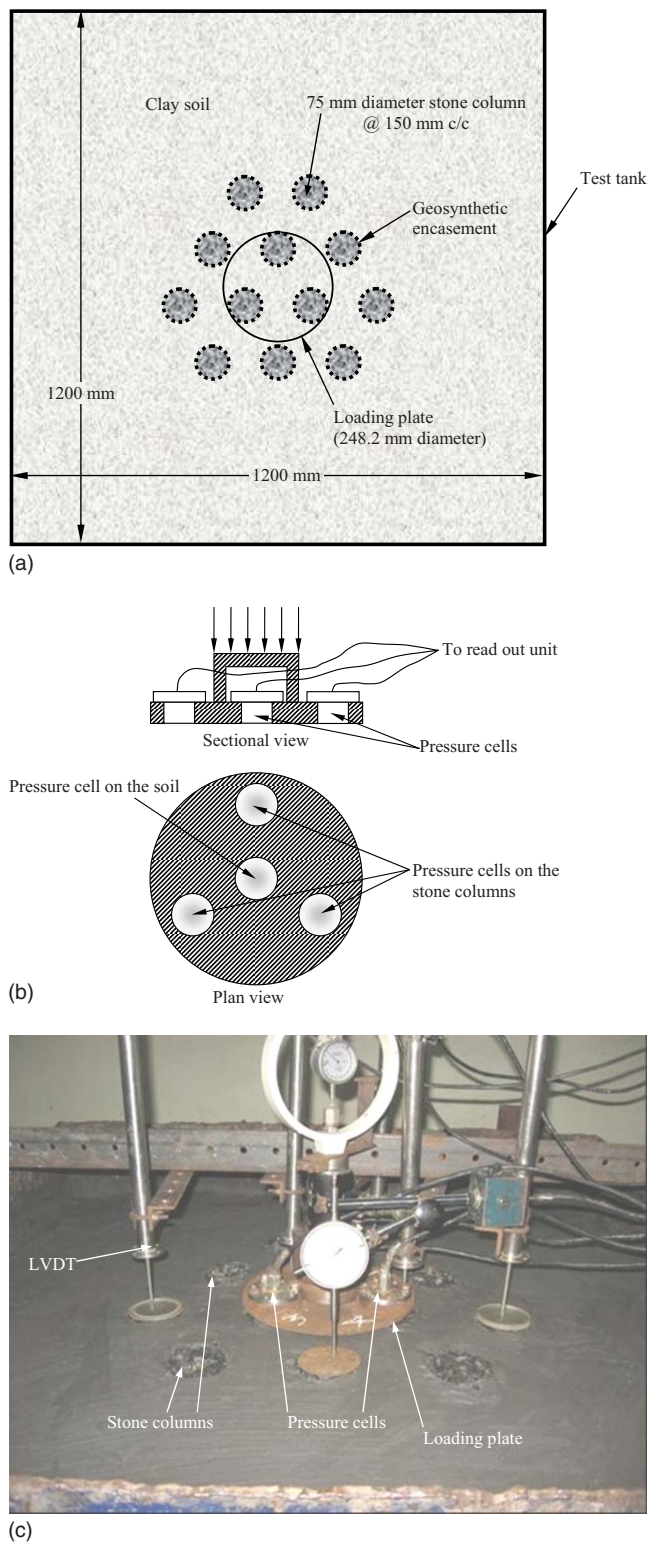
Load Tests on a group of stone columns. (a) Plan view of a group of stone columns (area replacement ratio among group=0.23); (b) schematic of the loading plate fitted with pressure cells; and (c) photographic view of load test.
